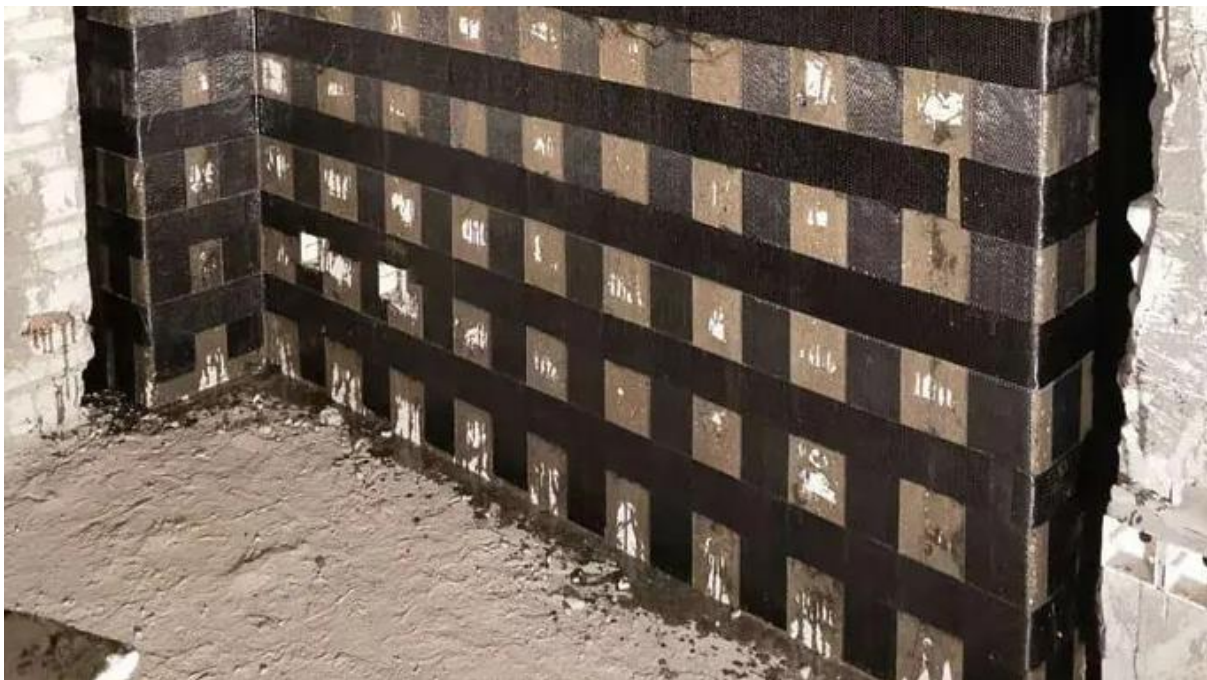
Example image of a concrete shear wall strengthened through the introduction of carbon fibre reinforcing in both vertical and horizontal directions.
